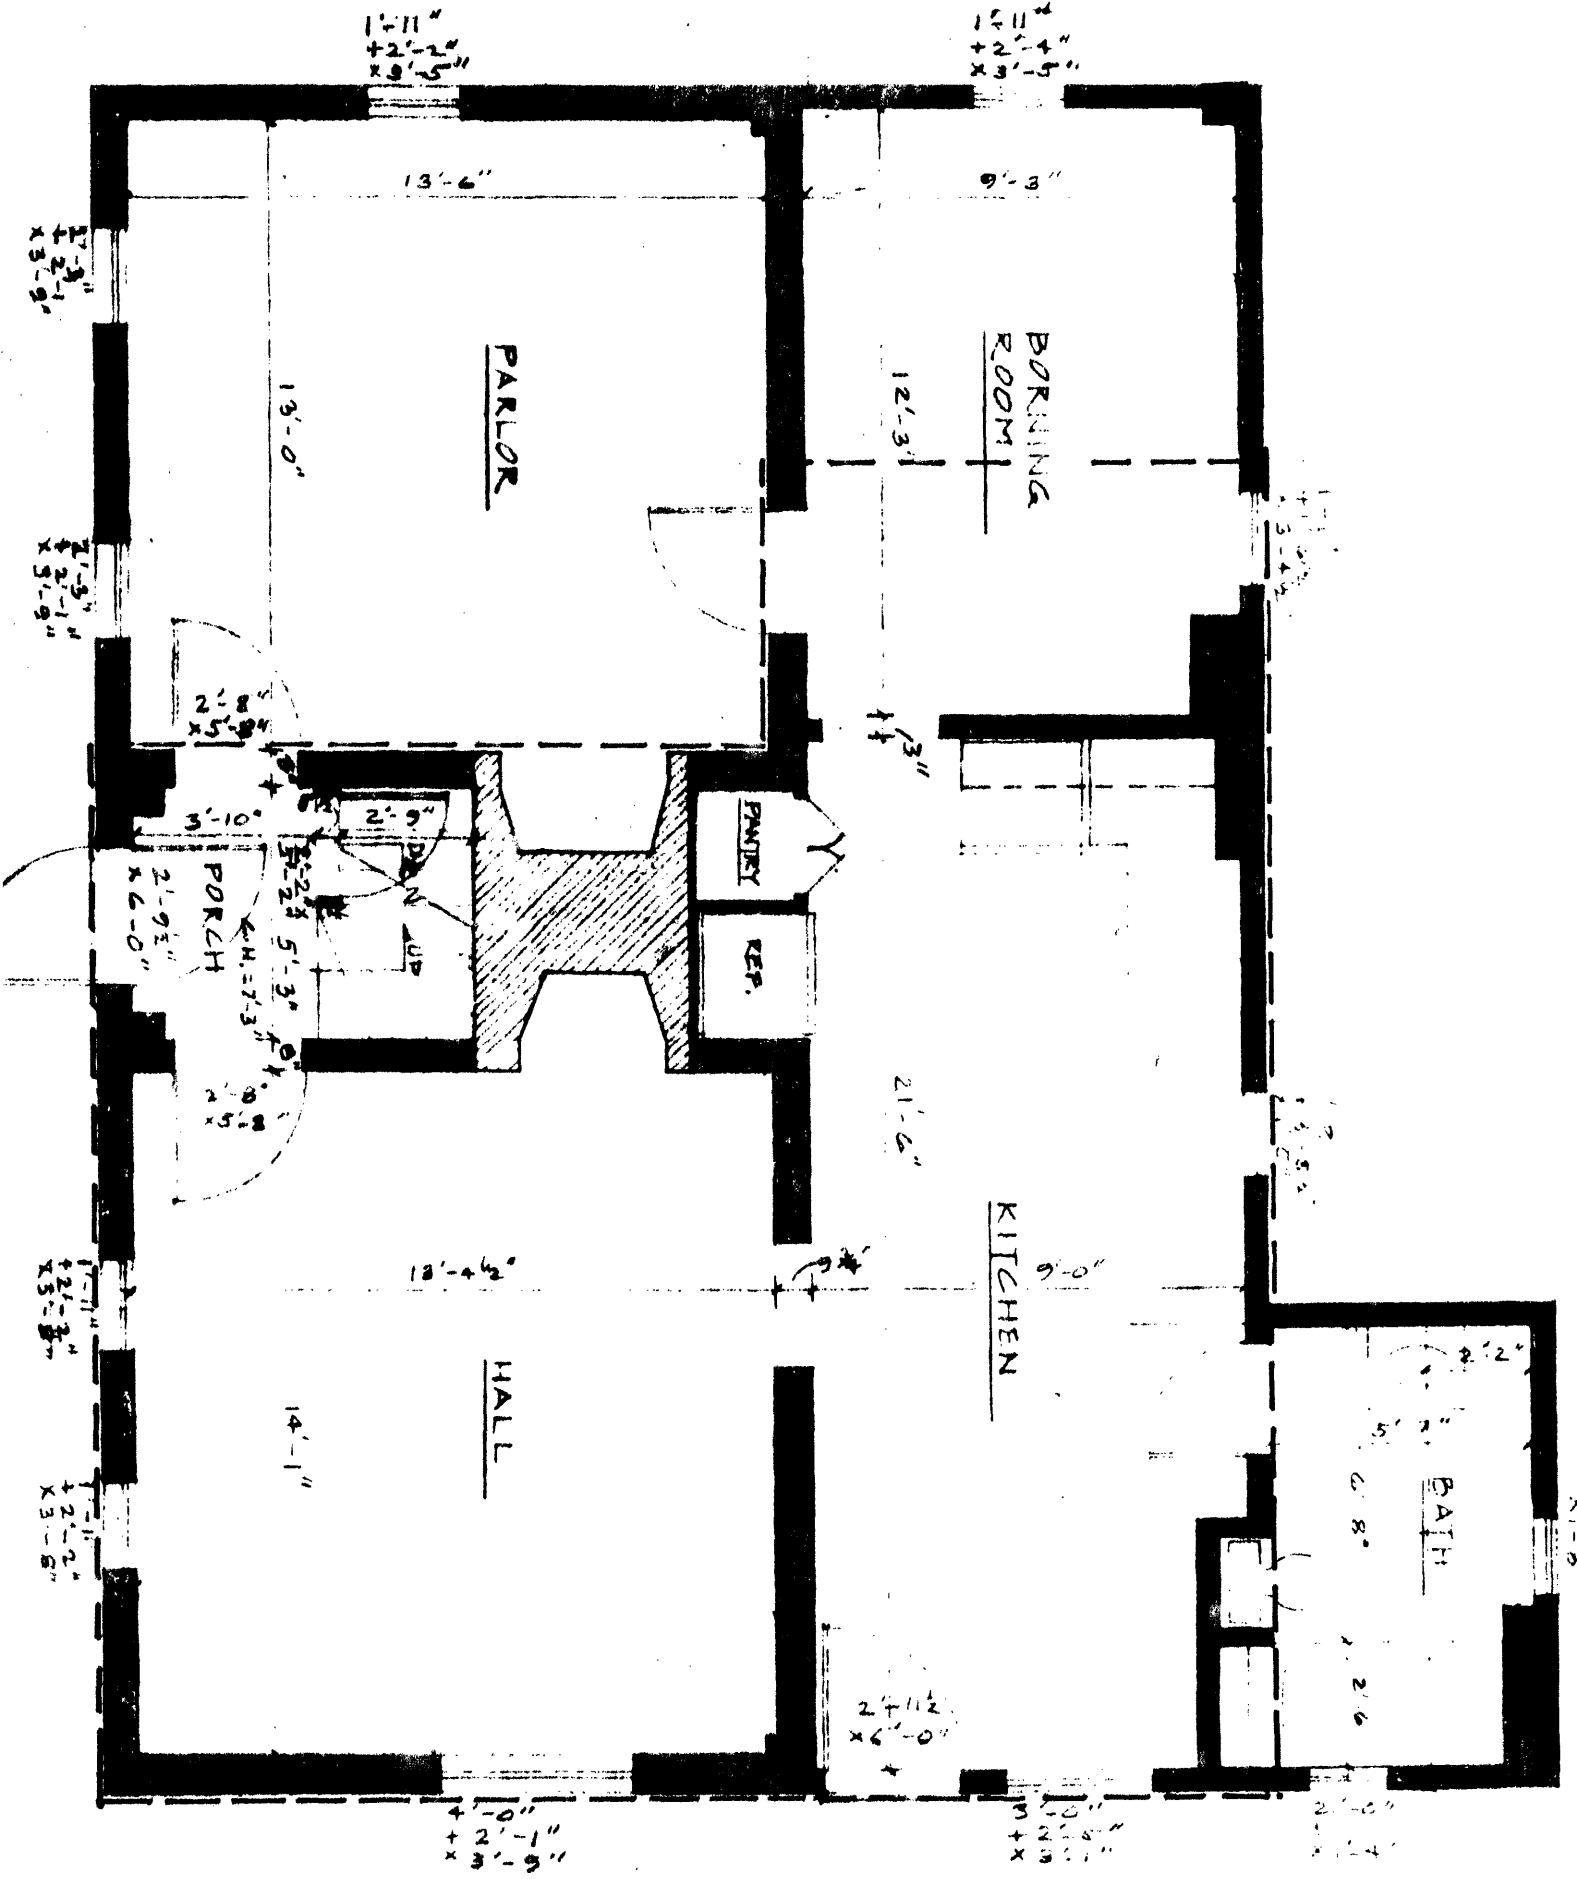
EXHIBIT A: First Floor Plan - Samuel Ferris House, Greenwich, Connecticut
